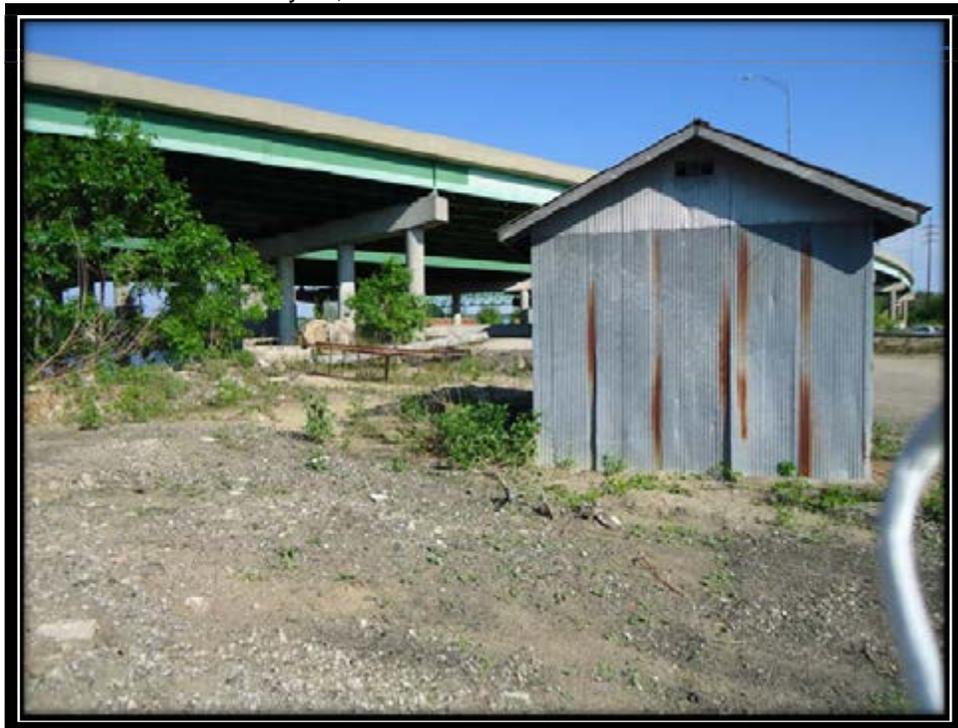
Debris and Abandoned Building on Crest of Ash Pond 3
